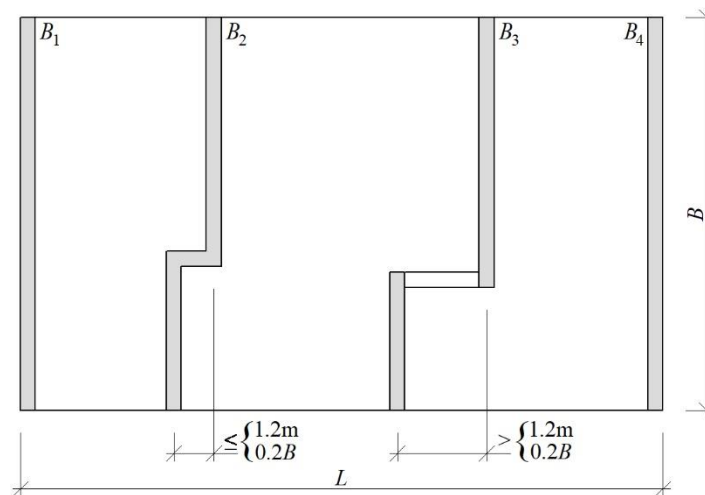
Stiffening wall with a complex layout:  $B_1, B_2, B_4$  – the stiffening wall treated as single stiffening strip,  $B_3$  - the stiffening wall treated as two independent stiffening strips
